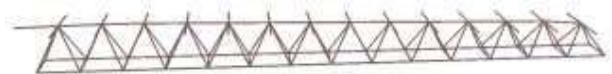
Rendered Elevation View of Optimized Space Frame with Top Grid Slope
